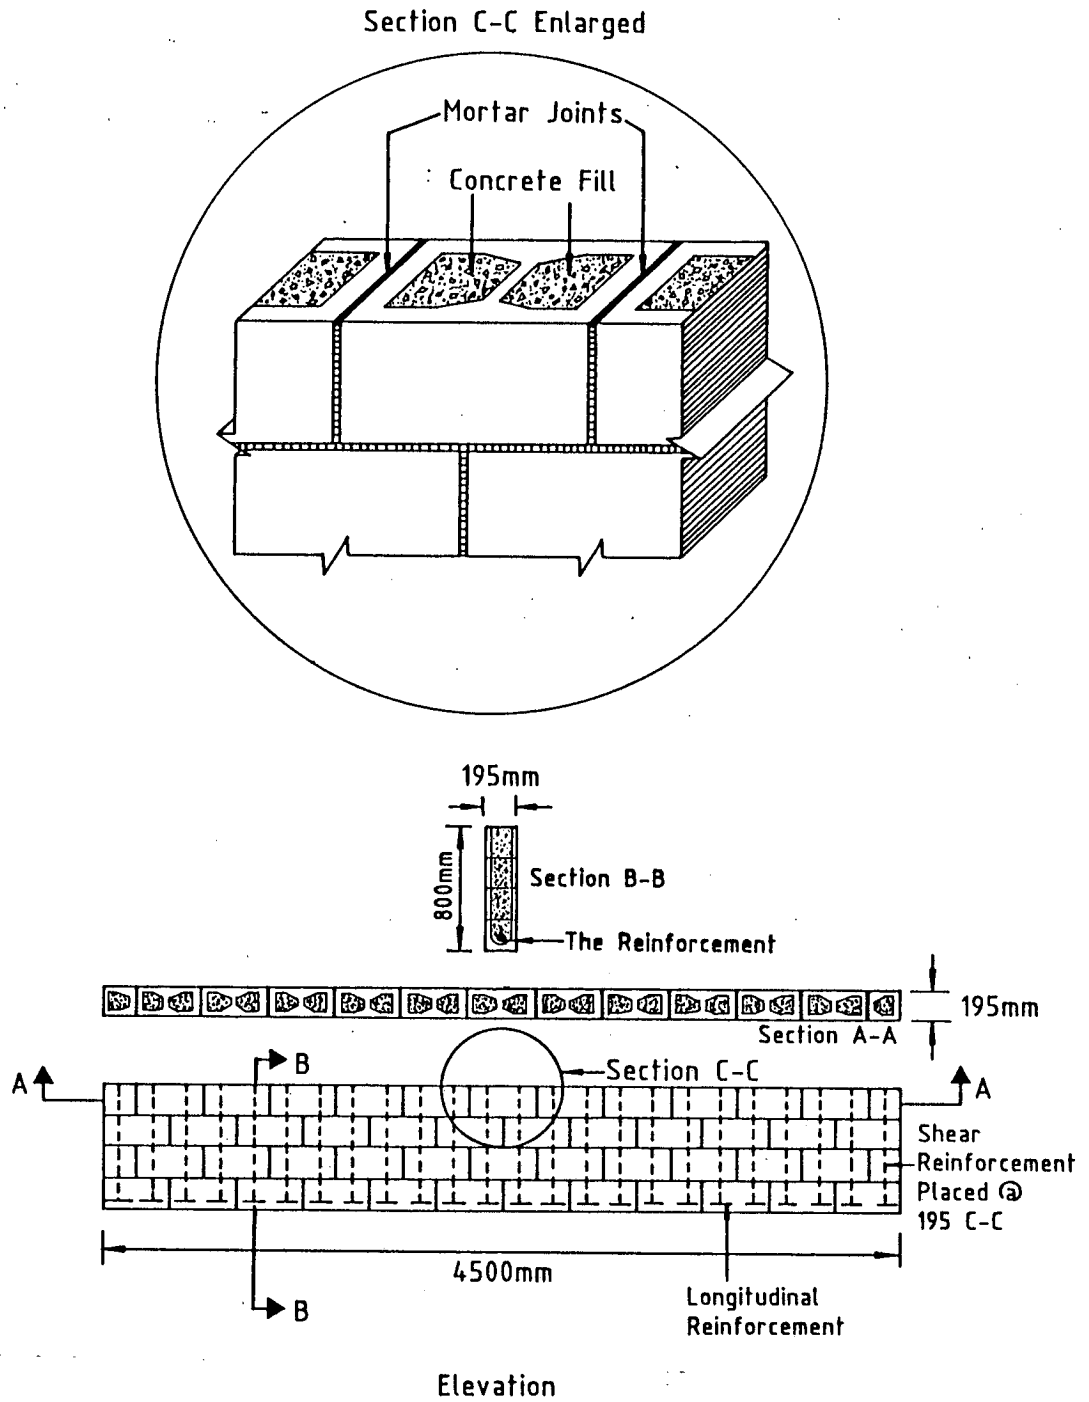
Typical compression zone in reinforced blockwork masonry beam.
